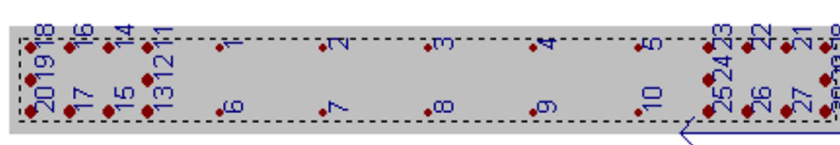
Vertical reinforcement arrangement used in RC-Section Model
